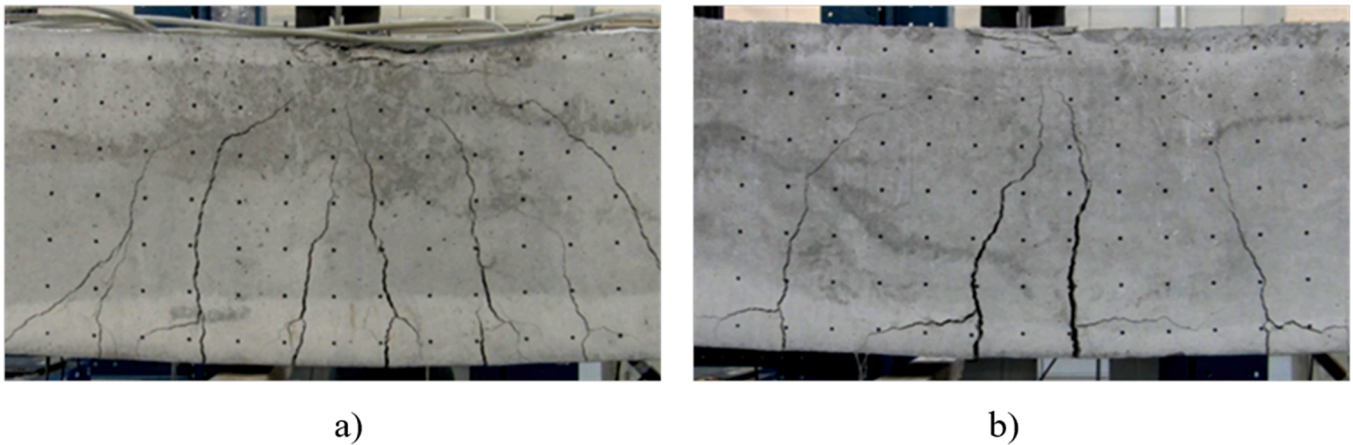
Cracking patterns near the failure: a) pitting corrosion (V3), b) general and pitting corrosion (V5).
